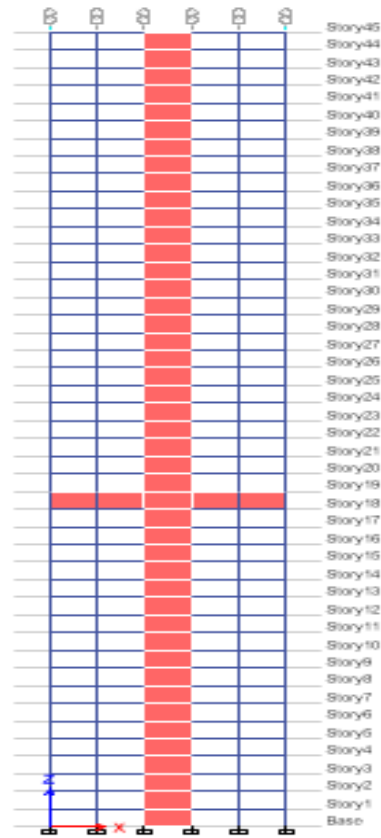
Structural model with 1 outrigger and belt truss system (SM 1)
